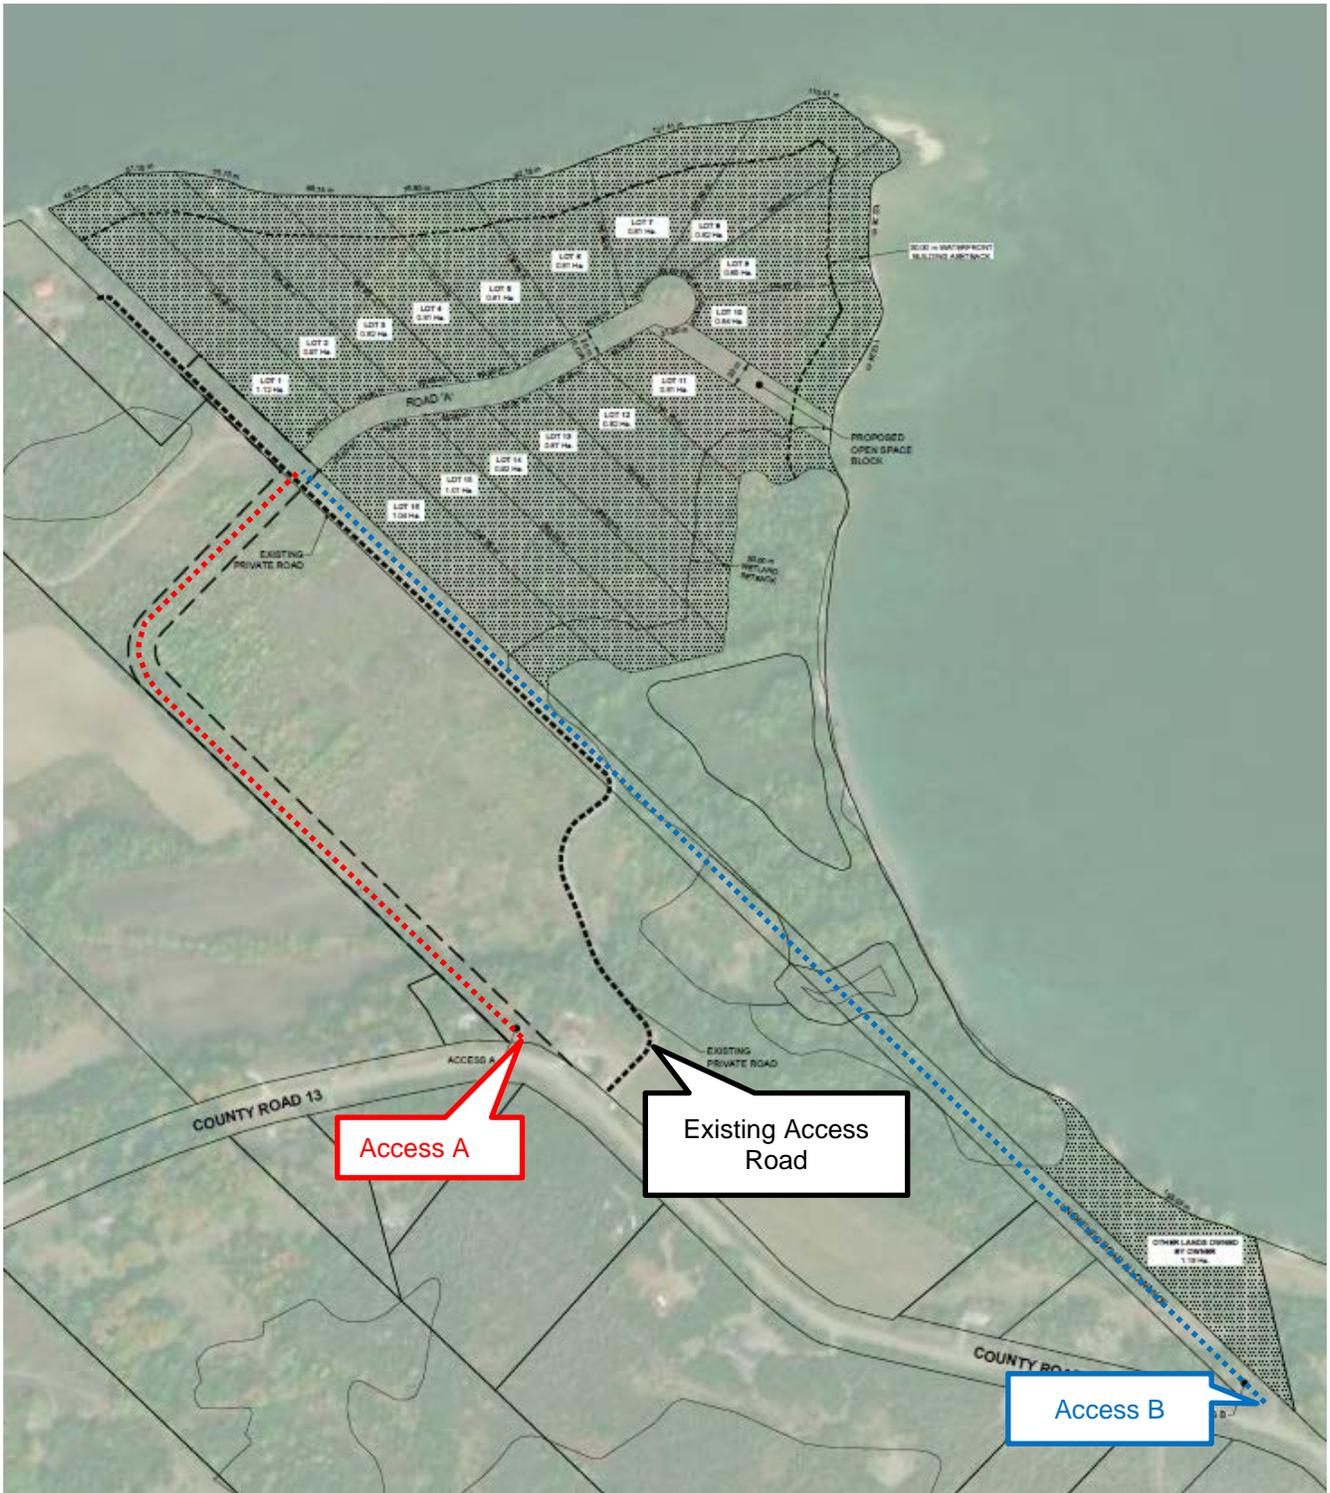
Proposed Conceptual Subdivision Plan (source: IBI Group)
